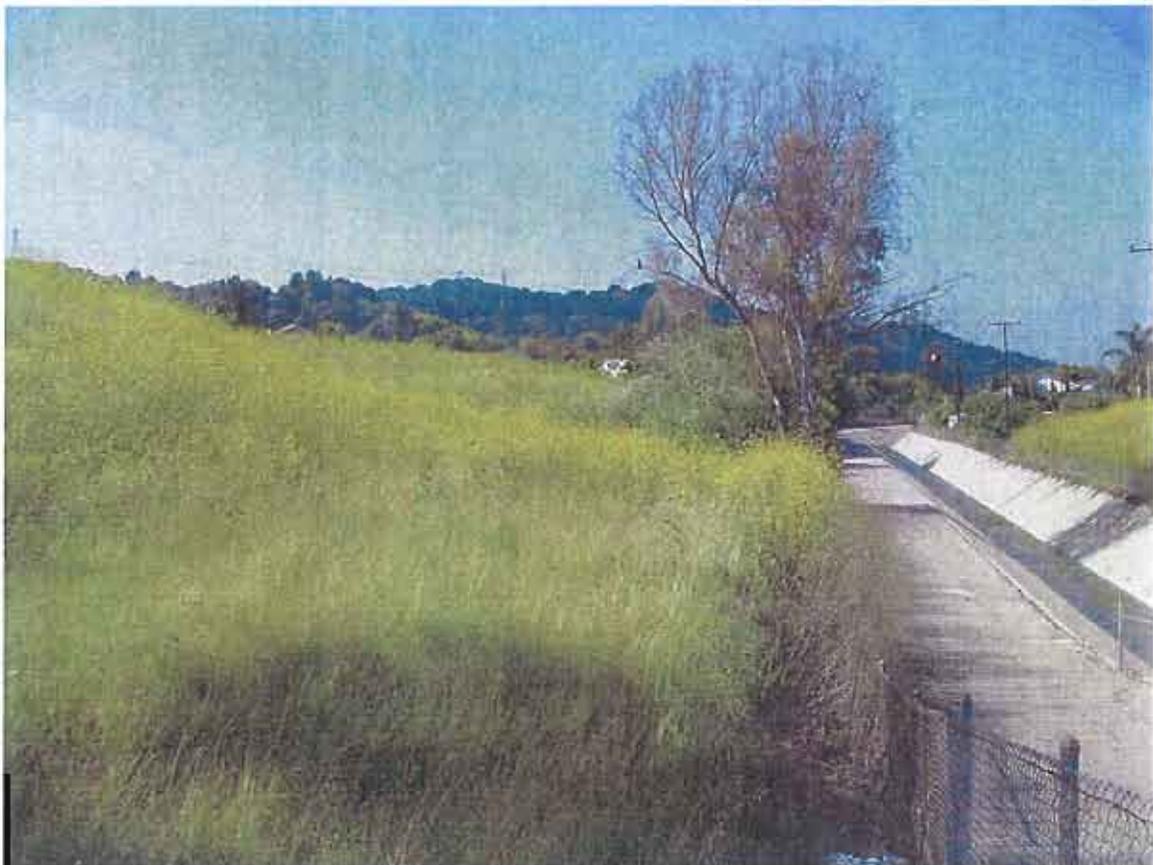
VIEW LOOKING SOUTHWEST ALONG THE SITE BOUNDARY FROM THE NORTHWEST CORNER OF THE SITE. THE CONCRETE DRAINAGE CHANNEL SHOWN BORDERS THE SITE TO THE WEST.
